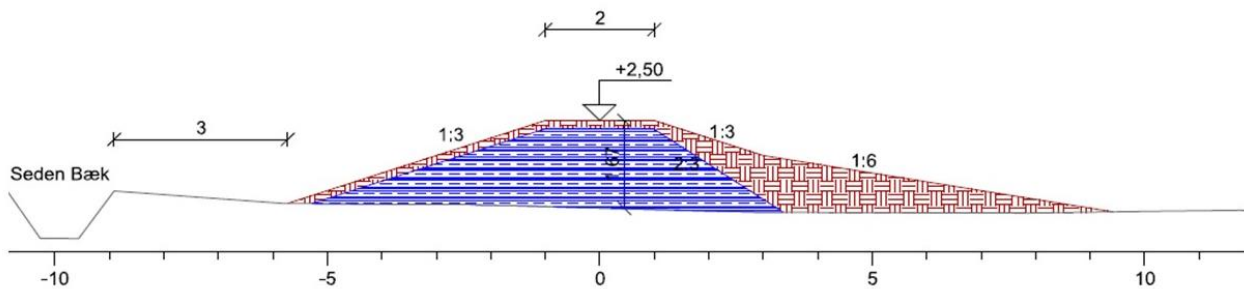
Cross section drawing of the new dike at Seden Strand. (Rambøll)
